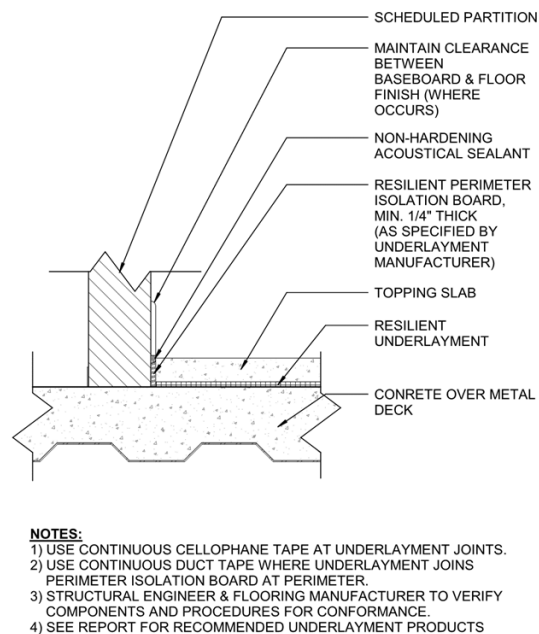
Floor Assembly with Topping Slab (for Polished Concrete)
